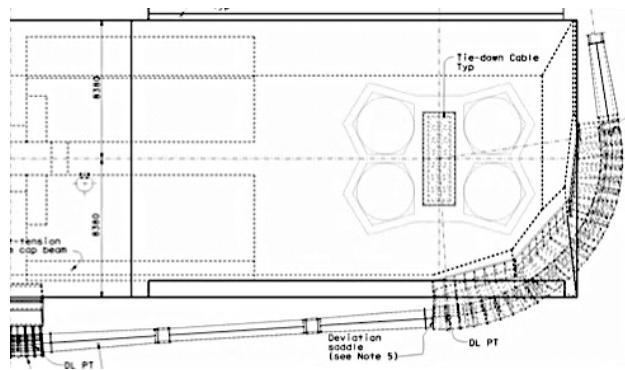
Half of Pier W2 plan view (Ref.: *Caltrans drawings 728/1204*).
